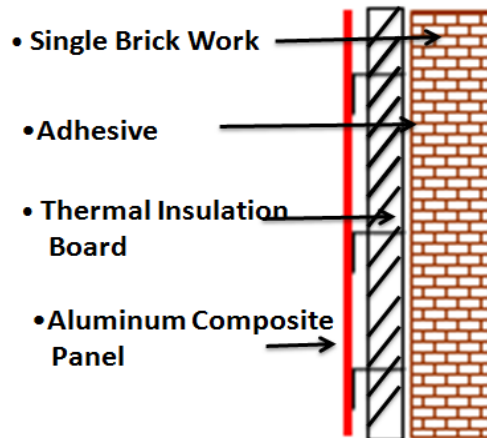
EXTERNAL WALL FIBROUS INSULATION BEHIND CLADDING
